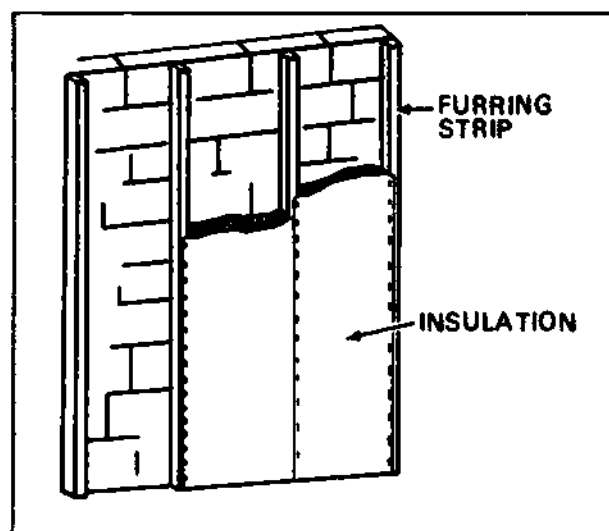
Furring strips may be added to a masonry wall to provide for flexible insulation.
